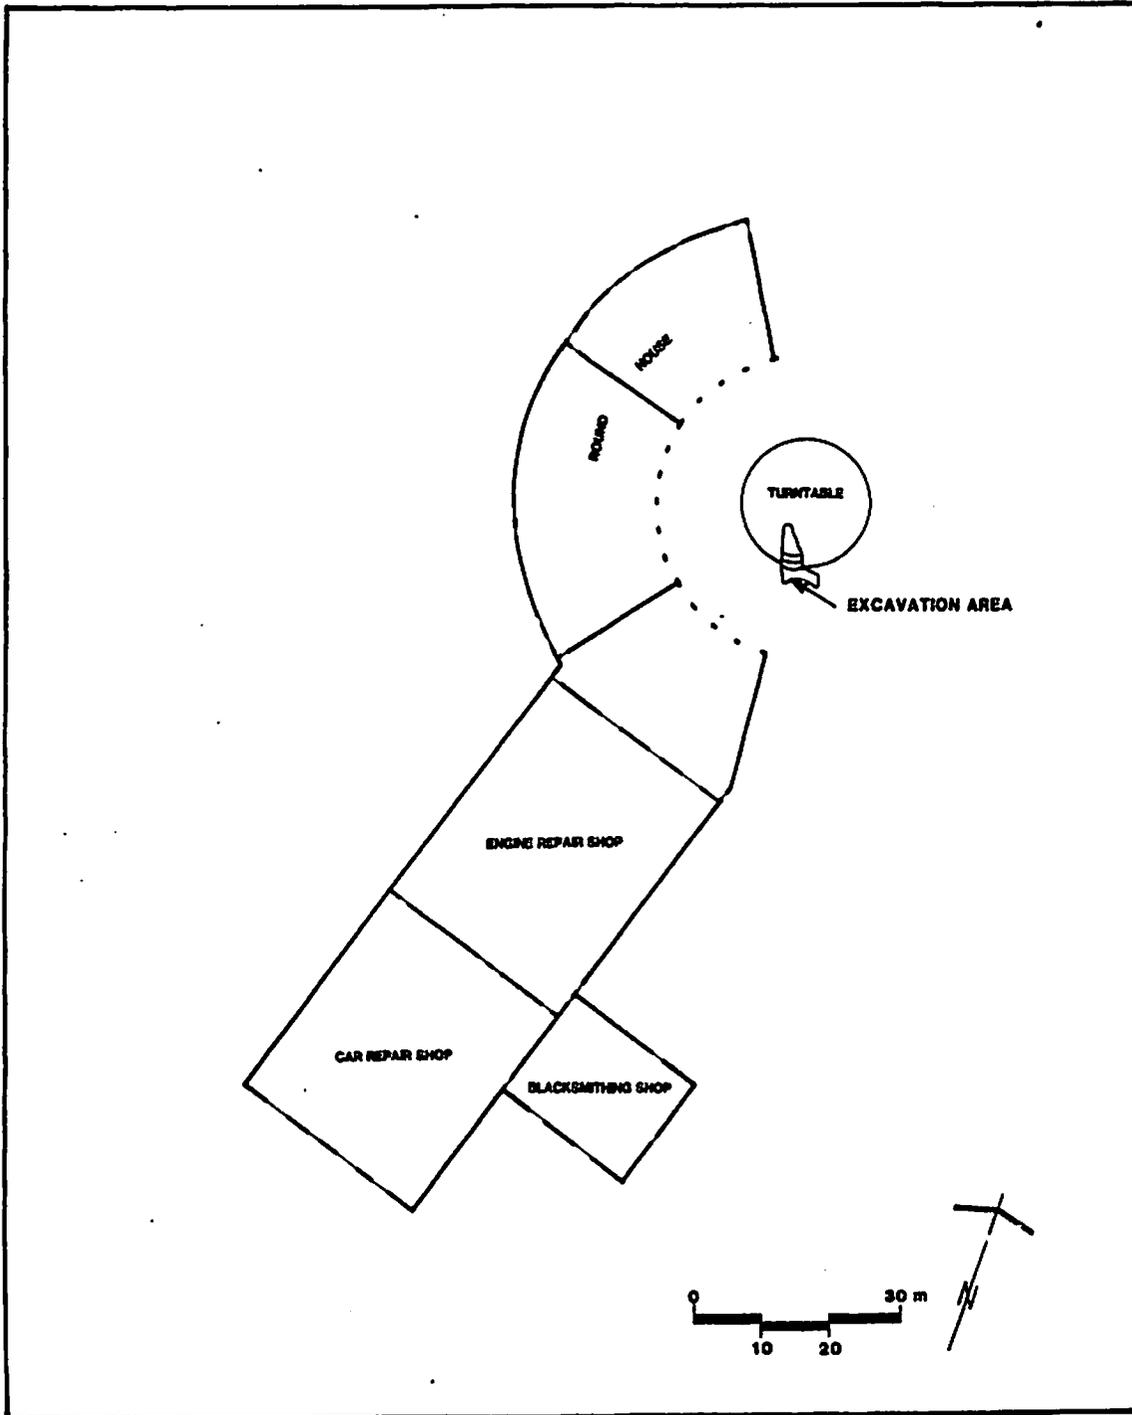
Plan of shops and roundhouse; indicating probable location of excavated foundation, (Drawn by D. Elrick.)
